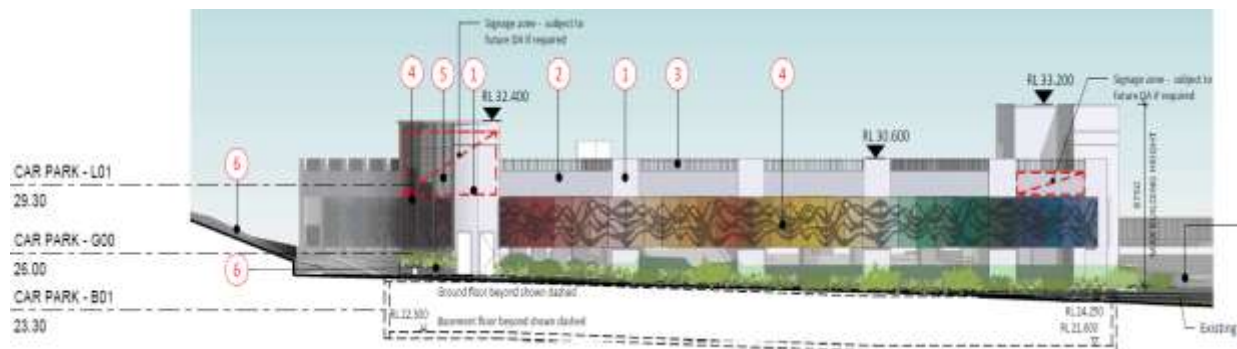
Northern elevation (as viewed from Darcy Road). Source: Alleanza Architecture
